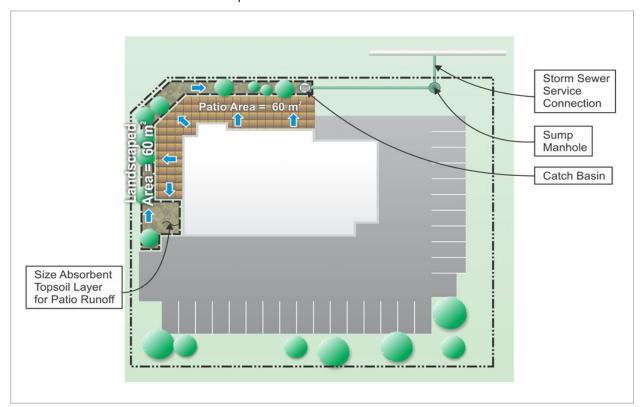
Example - Plan view of site with patio and landscape areas highlighted
